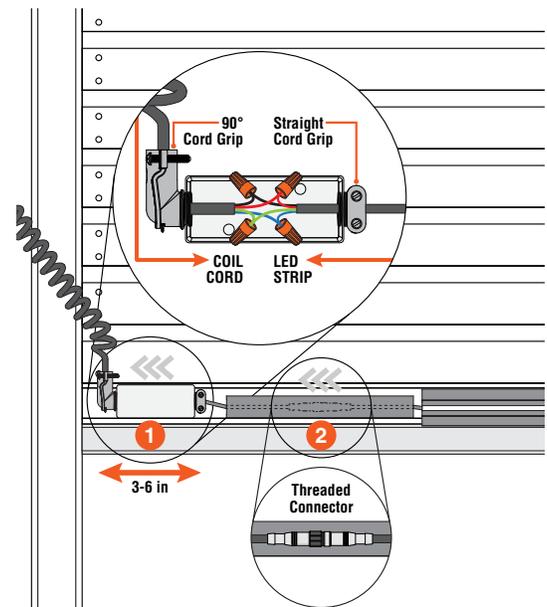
B: Rolling Steel Door Junction Box Placement & Wiring
